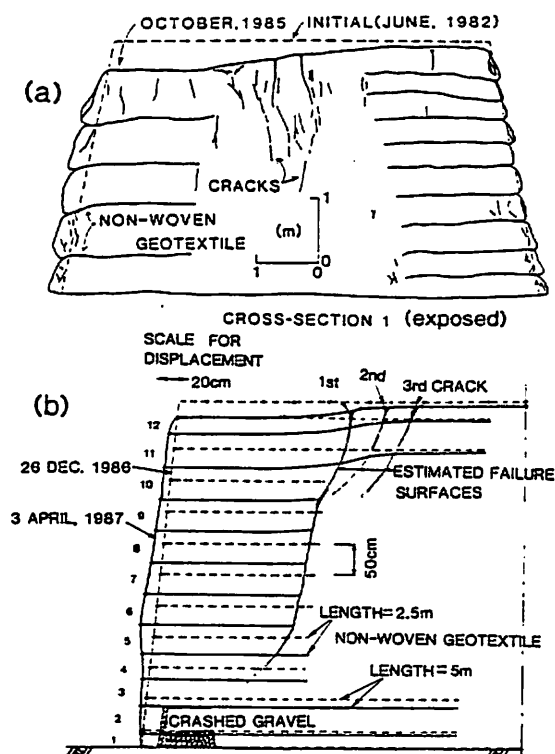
Cross-section of failed clay wall having a Type A facing; (a) exposed cross-section of Test Embankment No. 1, and (b) estimated cross-section of Test Embankment No. 3 (Tatsuoka et al., 1986, 1986a, 1991, Nakamura et al., 1988).
